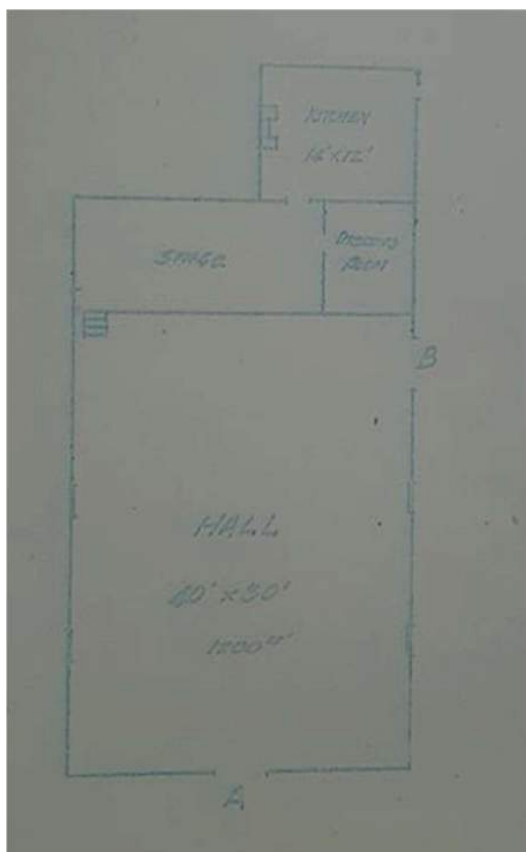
Plan for the Queenstown Mechanics Institute, with kitchen shown at rear, 1952. (Source: PROV 1925-85, Public Building File).
